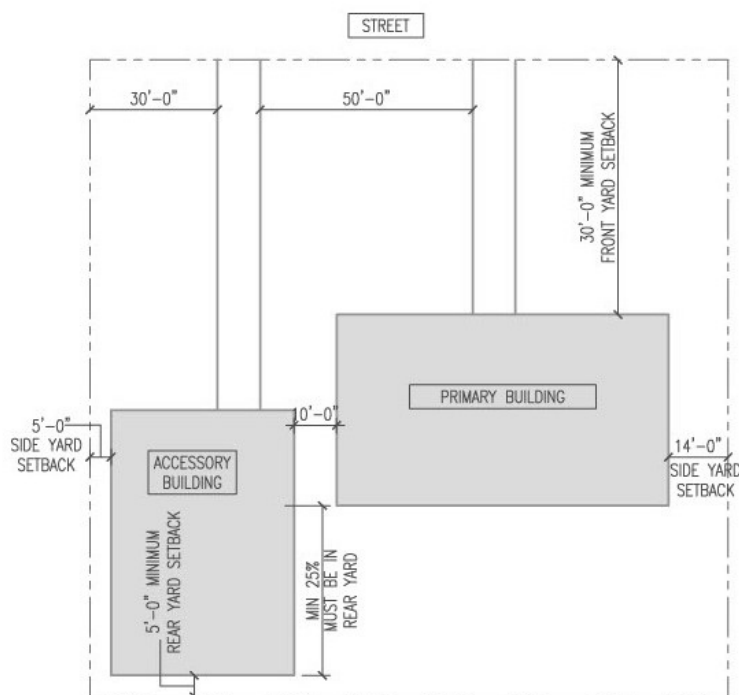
DETACHED ACCESSORY BUILDING EXAMPLE 1
